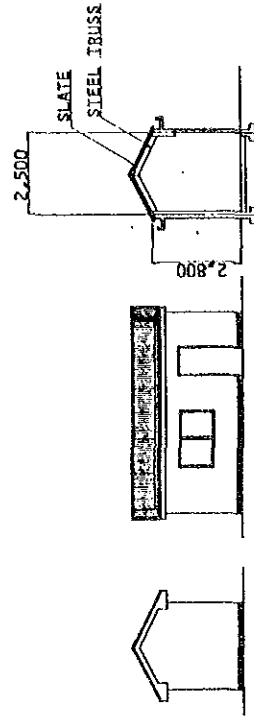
Machine Shed and Equipment Control Shed, Plan, Front, and Side Views
